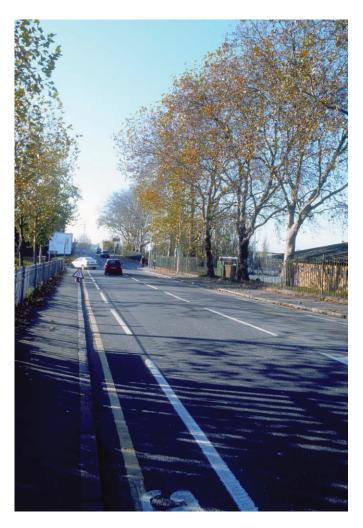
The eastern approach road to Temple Mill Lane Bridge, looking west (43707009)
